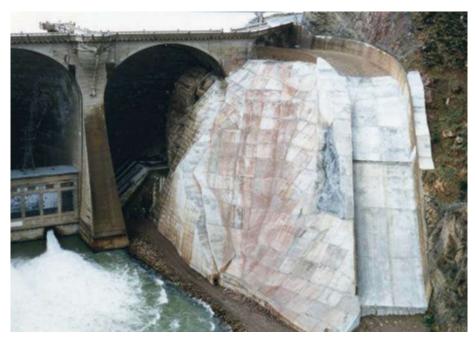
Photo showing finished left spillway concrete overlay and overtopping protection on lower left abutment of dam (Reclamation).
